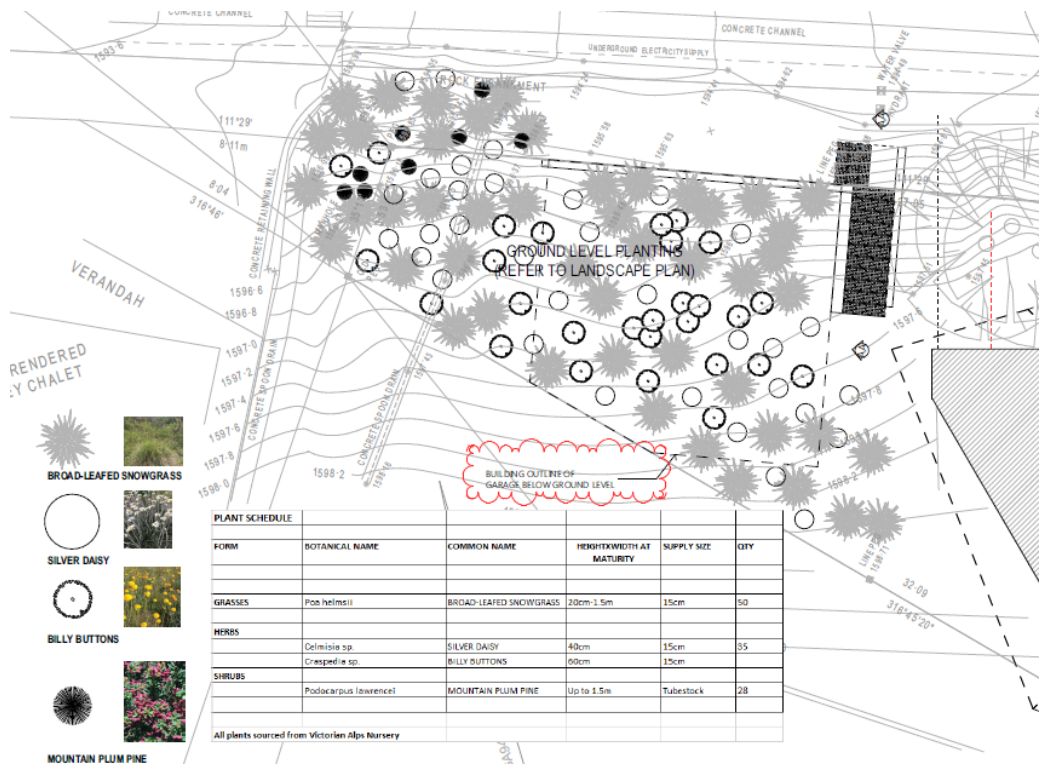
Landscaping/rehabilitation plan (Source: Application)
